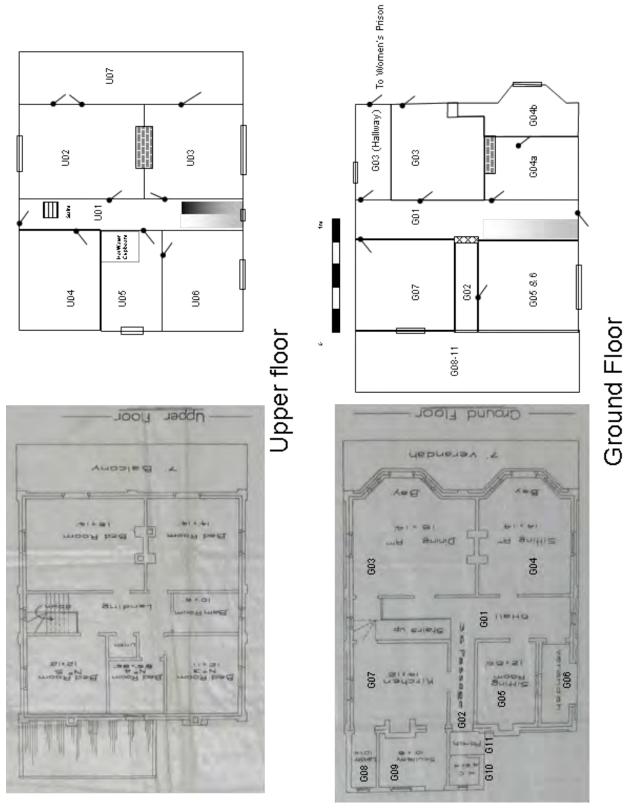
Floor plan of Superintendent's House (left: as shown in 1902 plan; right: as recorded in 2008)
